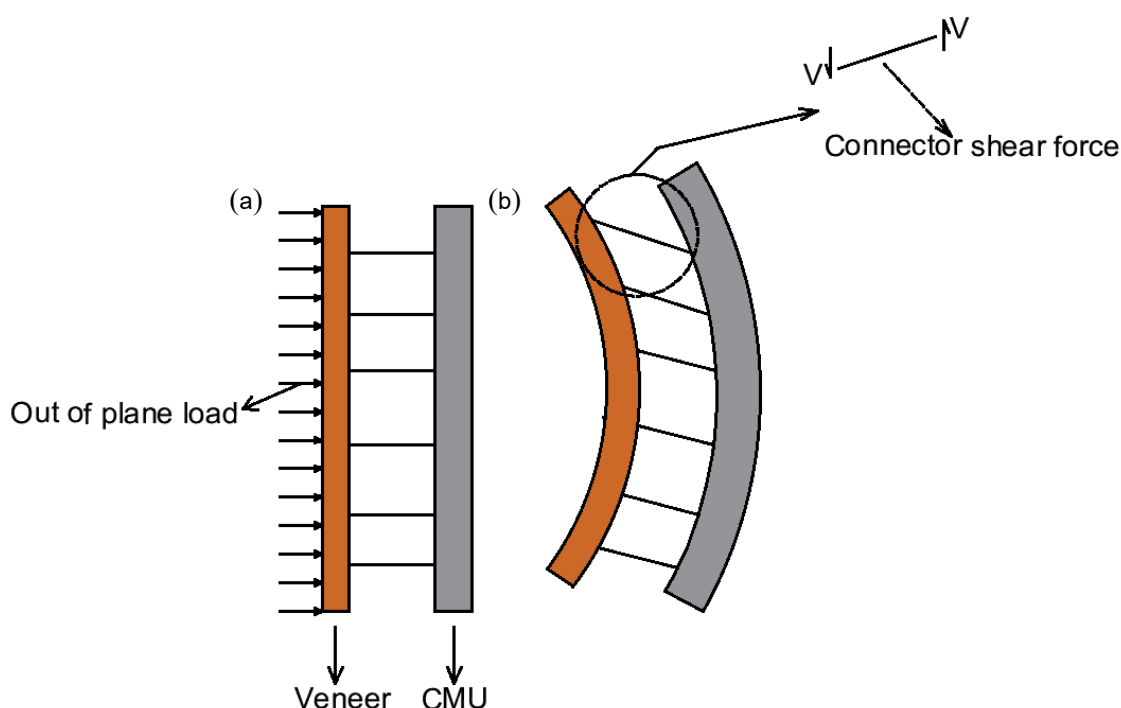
(a) cavity wall under out-of-plane loading (b) response of cavity wall under out-of-plane loading
